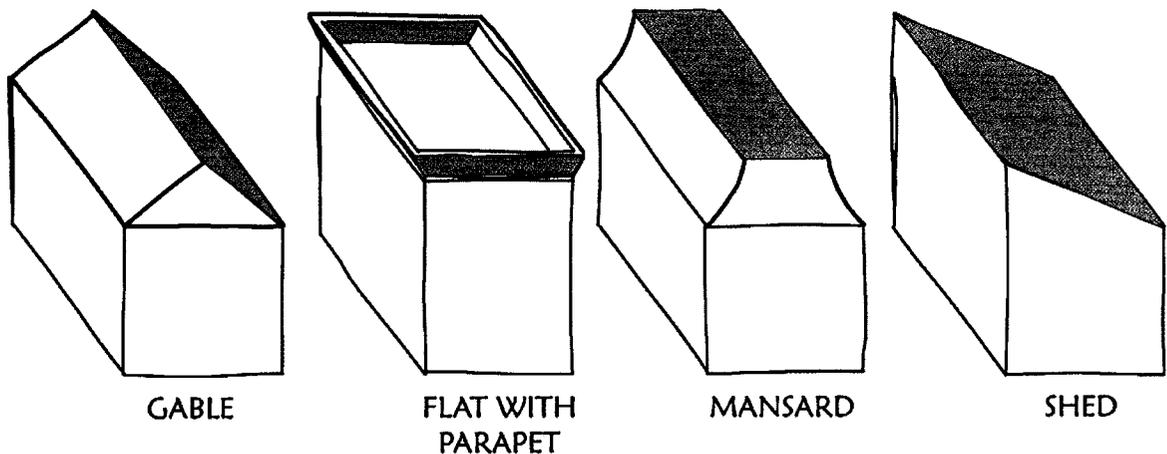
Sloped roofs with dormers and gables are preferred to mansard or shed roofs.
